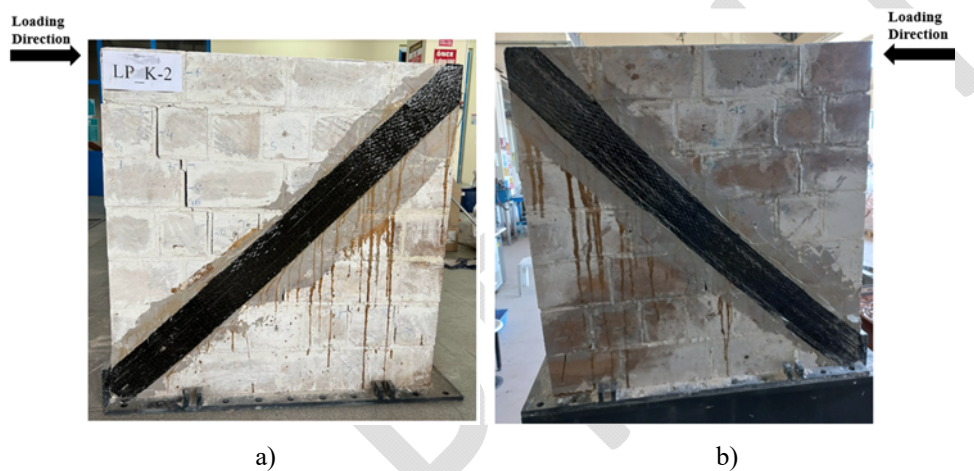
Crack patterns of LP_K-S wall (a) front view, (b) back view.
